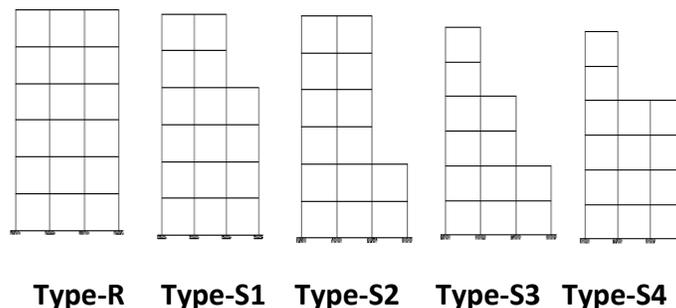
Typical building elevations for six-storey building variants (R, S1 toS4)
